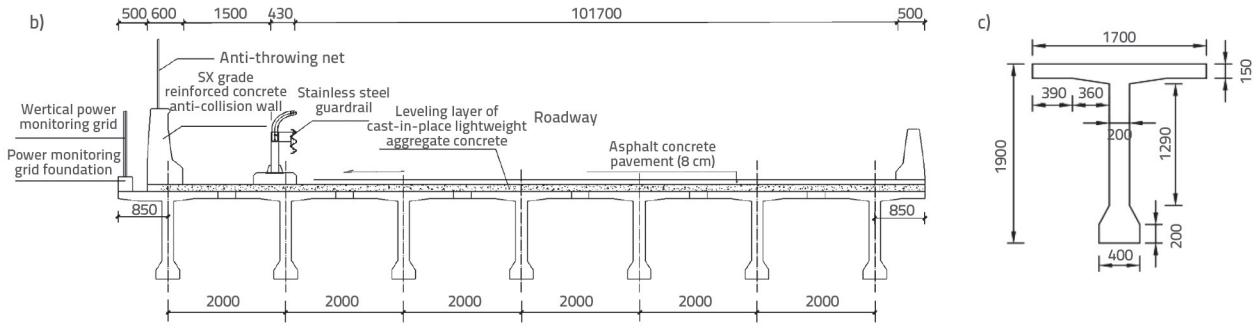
Bridge dimensions (mm): b) Bridge cross-section; c) Beam cross-section
